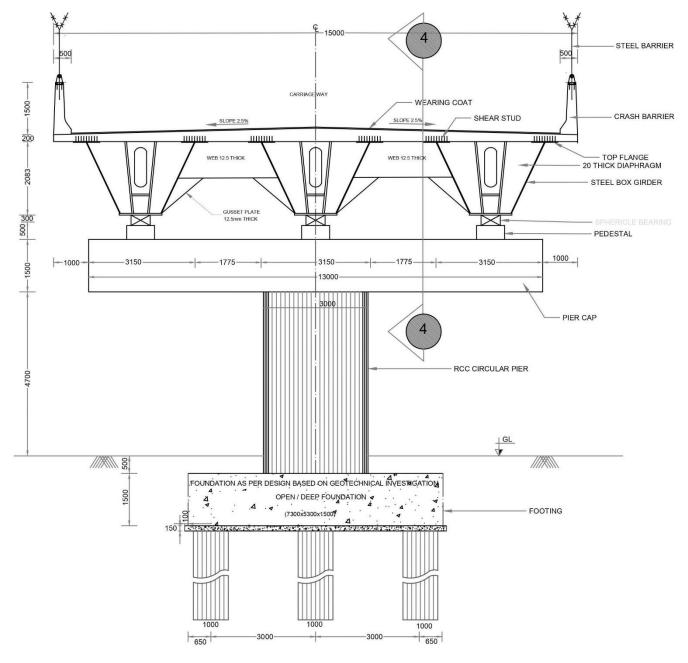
Sectional cross section of Trapezoidal box girder for 68.50m span
